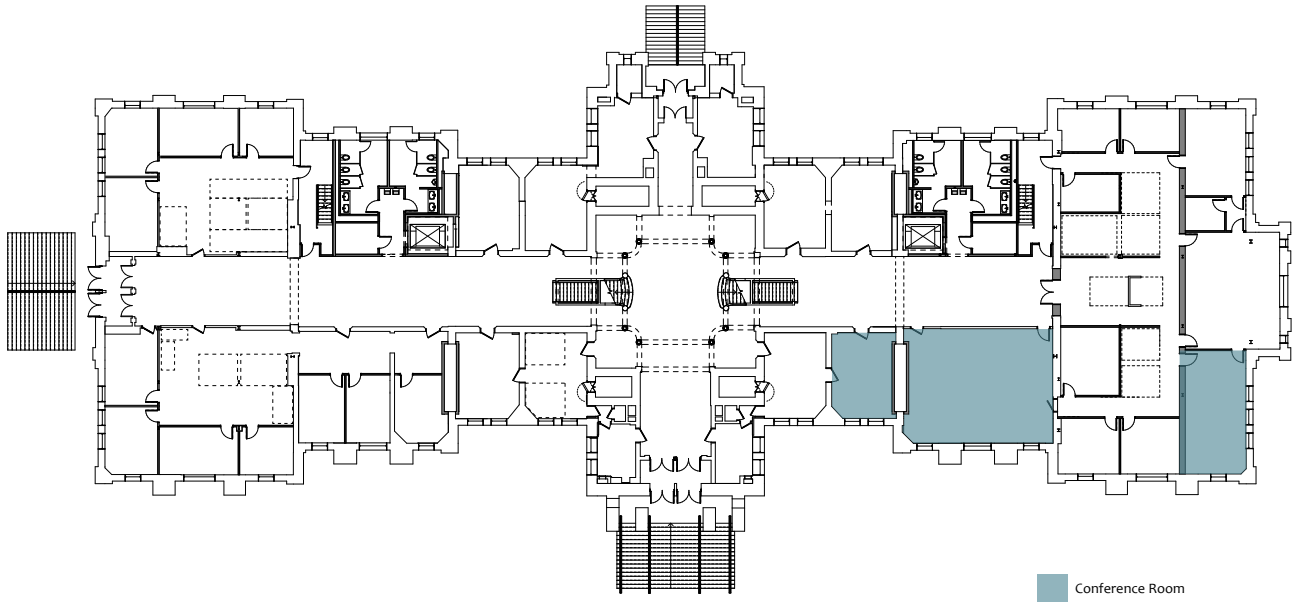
Proposed Conference Rooms - First Floor [Capitol]
